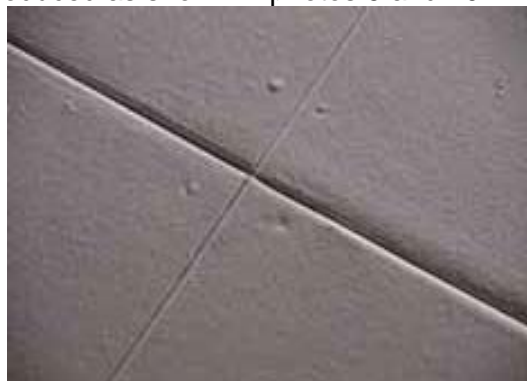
Fastener in asbestos cement sheeting does not sit level with the surface.
